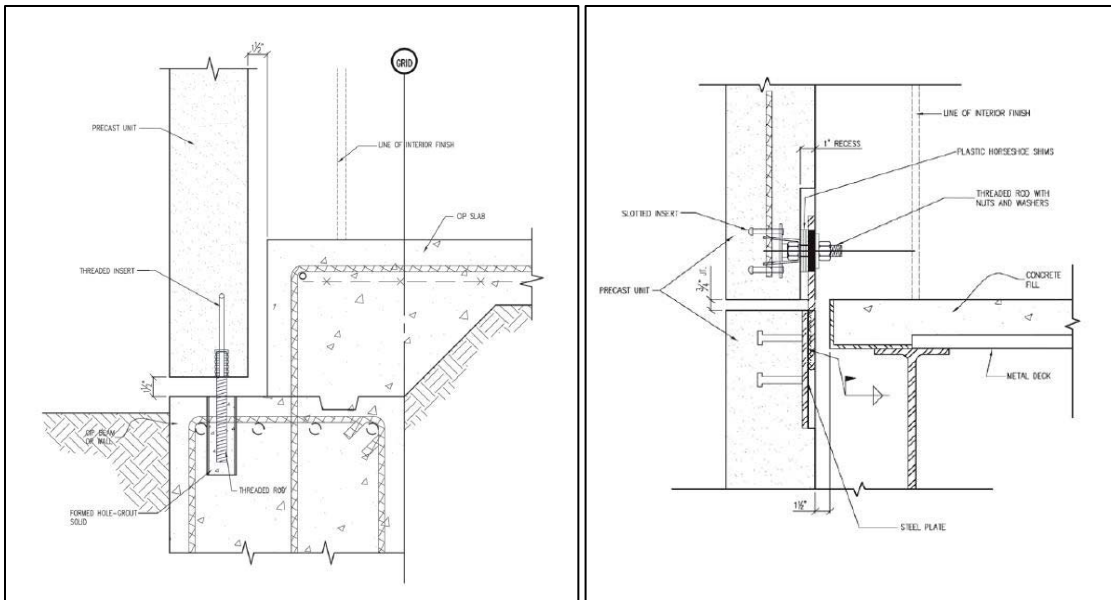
Far Left: Panel-foundation connection detail and panel-to-panel connection. Image from the NCPA Architectural Precast Connection Guide.
